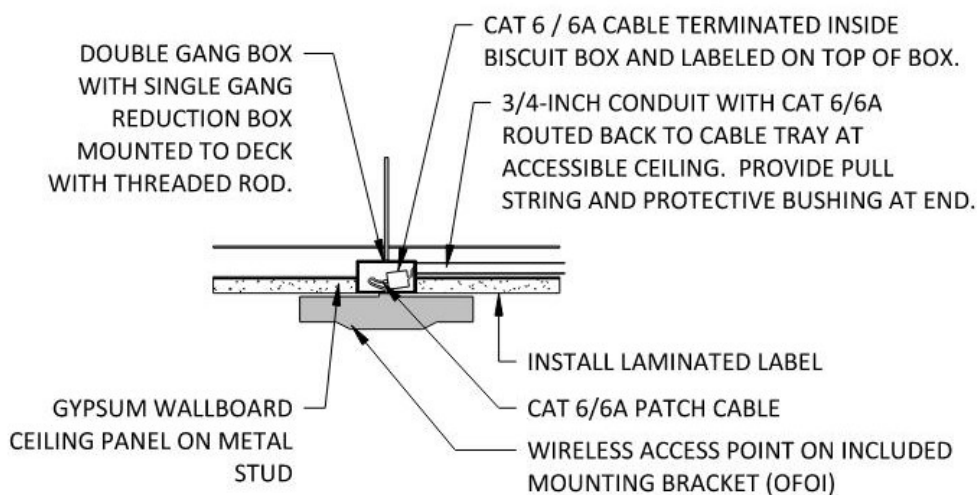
WAP Mounting – Exposed Ceiling: This diagram shows a section cut through a typical wireless access point (WAP) installed in an exposed ceiling condition. The WAP (OFOI) has an included mounting bracket that attaches to a double gang box or 4S box with single gang reduction box, mounted to deck with a threaded rod. From the WAP is a CAT 6/6A patch cable that will terminate inside a biscuit box with label. The cable will route through a 3/4-inch conduit back to a cable tray. The conduit has a pull string and protective bushing at the end.
